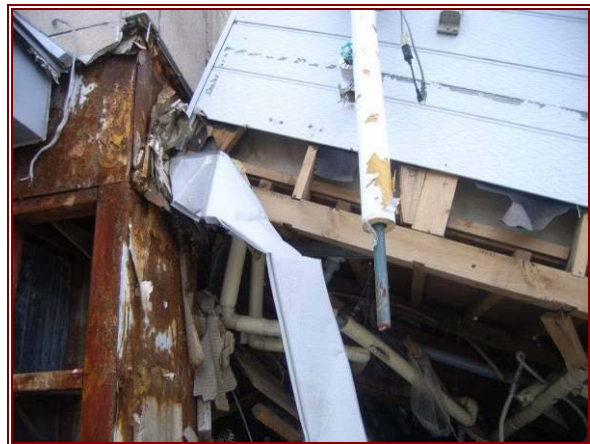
(right) Supported from complete collapse because wedged up against adjacent steel frame building.
